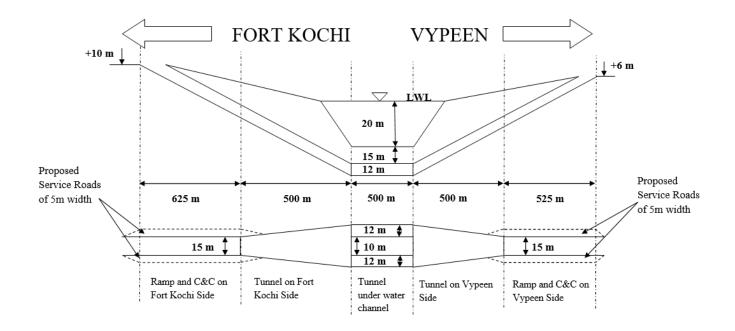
Longitudinal Profile and Plan of Proposed Tunnel
